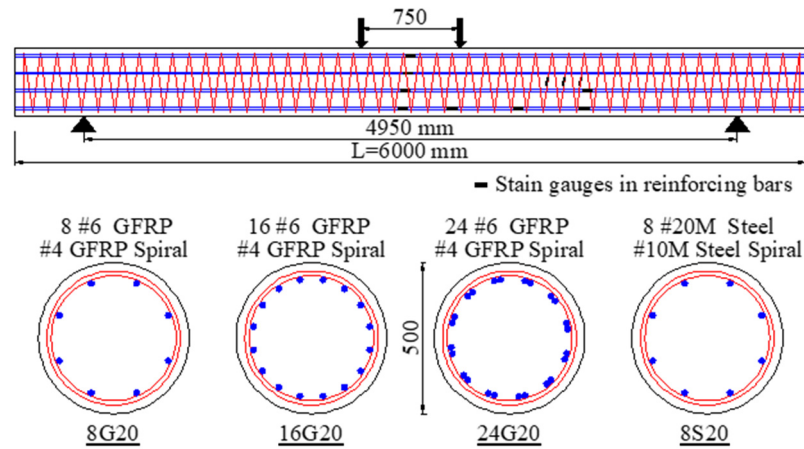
Dimensions and reinforcement details of the test specimens. (Note: all dimensions in mm; 1 mm = 0.0394 in)
